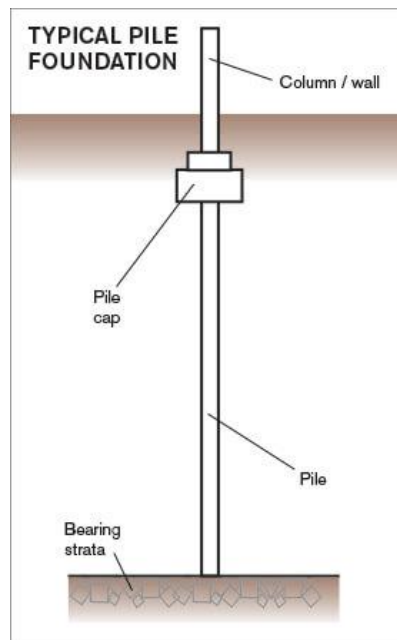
Typical pile foundation. (Bowels, 1996)
